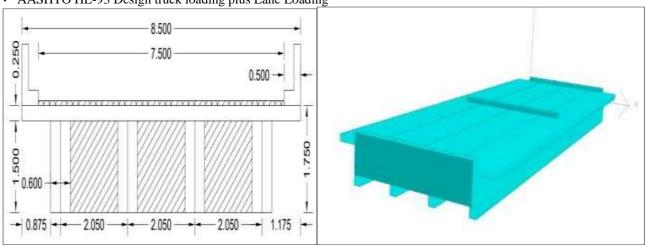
C/S OF RCC T-BEAM BRIDGE AND STADD MODEL
